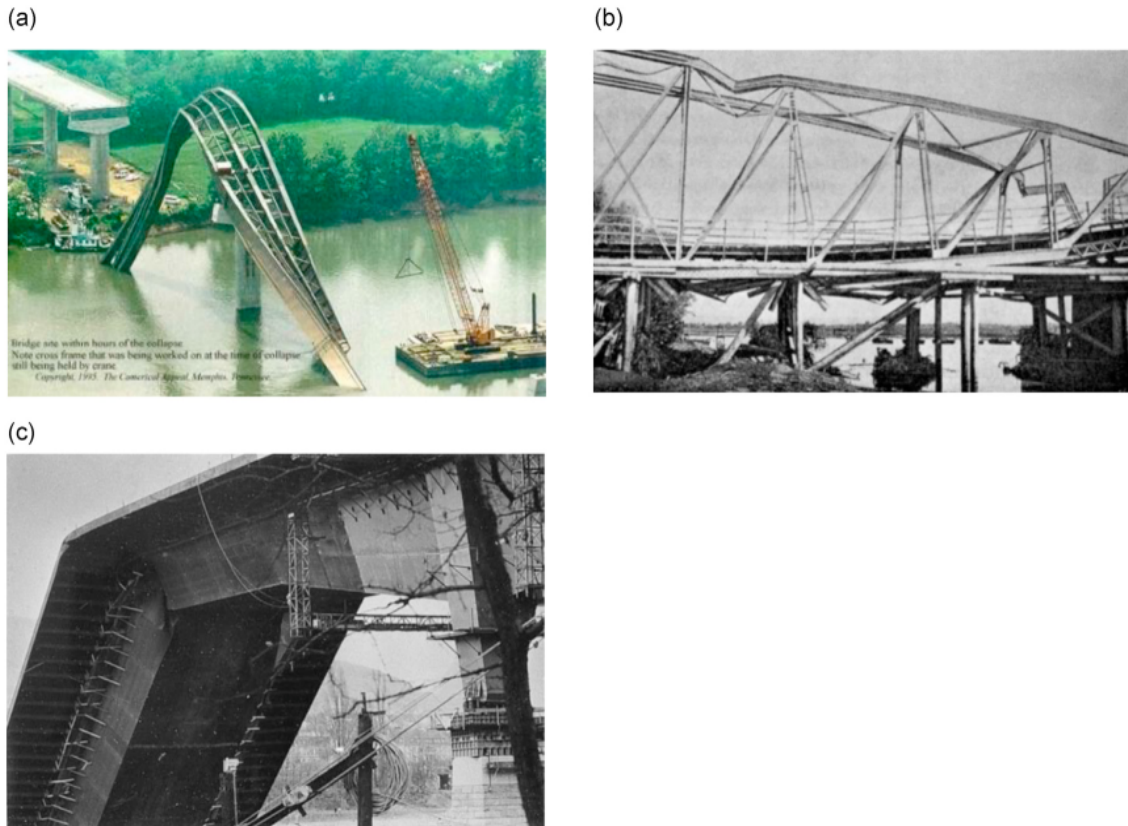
Steel bridge failures due to instability. (a) SR-69 Bridge. (b) Morava Bridge. (c) Rhine Bridge
